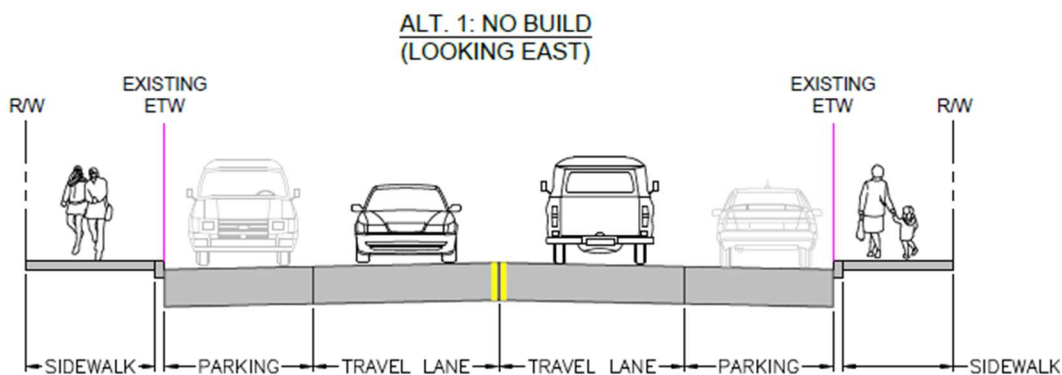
Coleman Avenue (City of Menlo Park) Alternative 1
